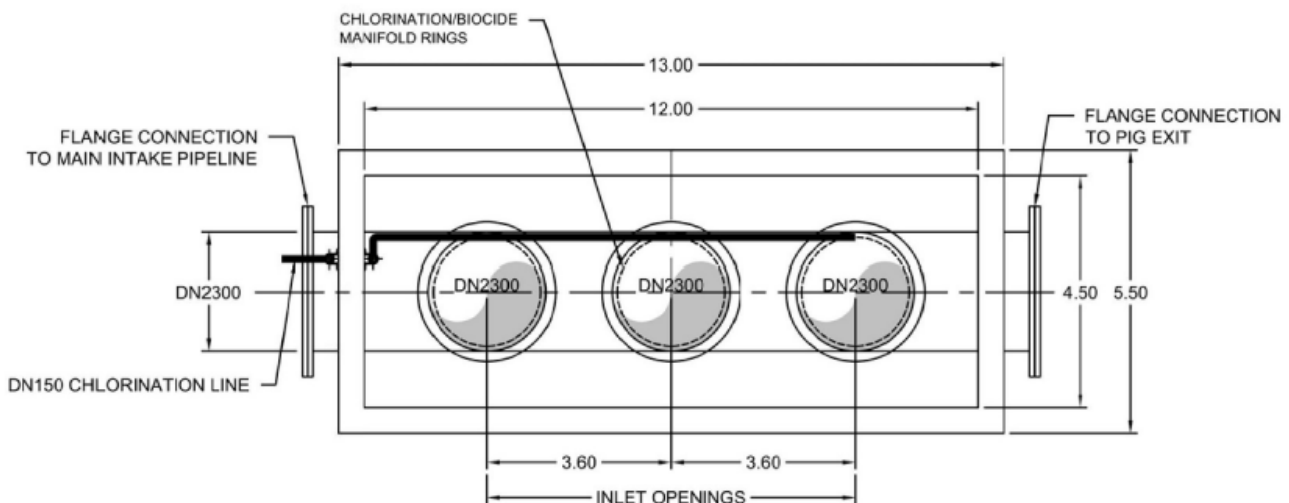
Intake Tower -Internal Plan View (Source: Dar/HR Wallingford, 2021)
